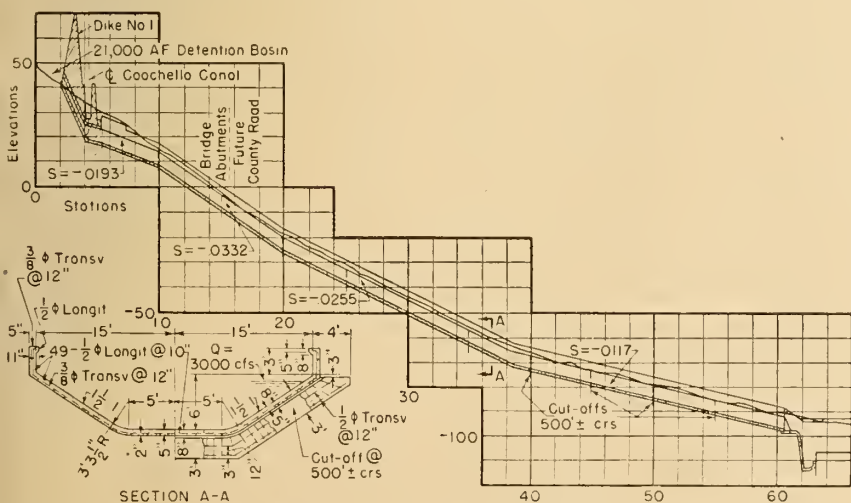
Wasteway No. 2, shown in section and profile, carries flash-flood waters under Coachella Canal and into Whitewater River storm channel leading to Salton Sea. Wasteways Nos. 1 and 3 are of similar construction.
